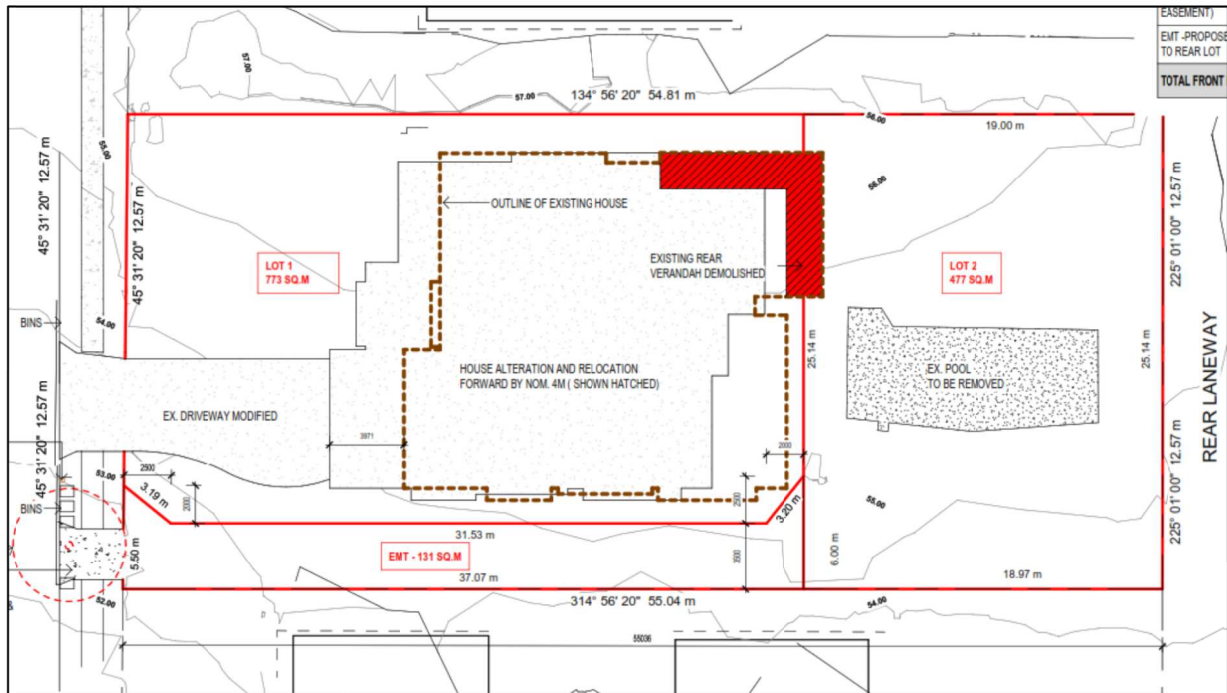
Amended ROL Plan Source: Ira Mehta Architect
